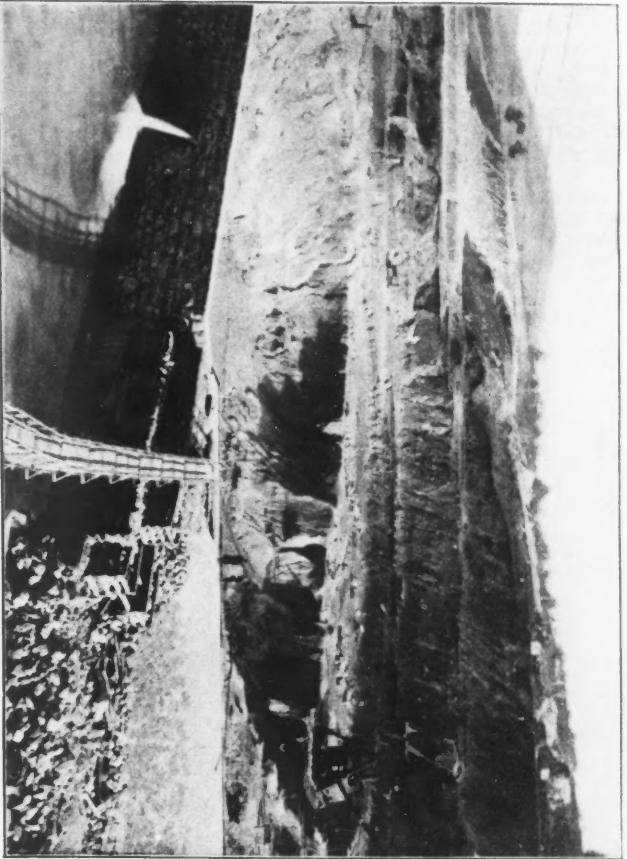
LOOKING SOUTHEAST, FEB. 7, 1896. NEW RIVER CHANNEL IN FLOOD, WITH EXCAVATION IN PROGRESS BEYOND.
